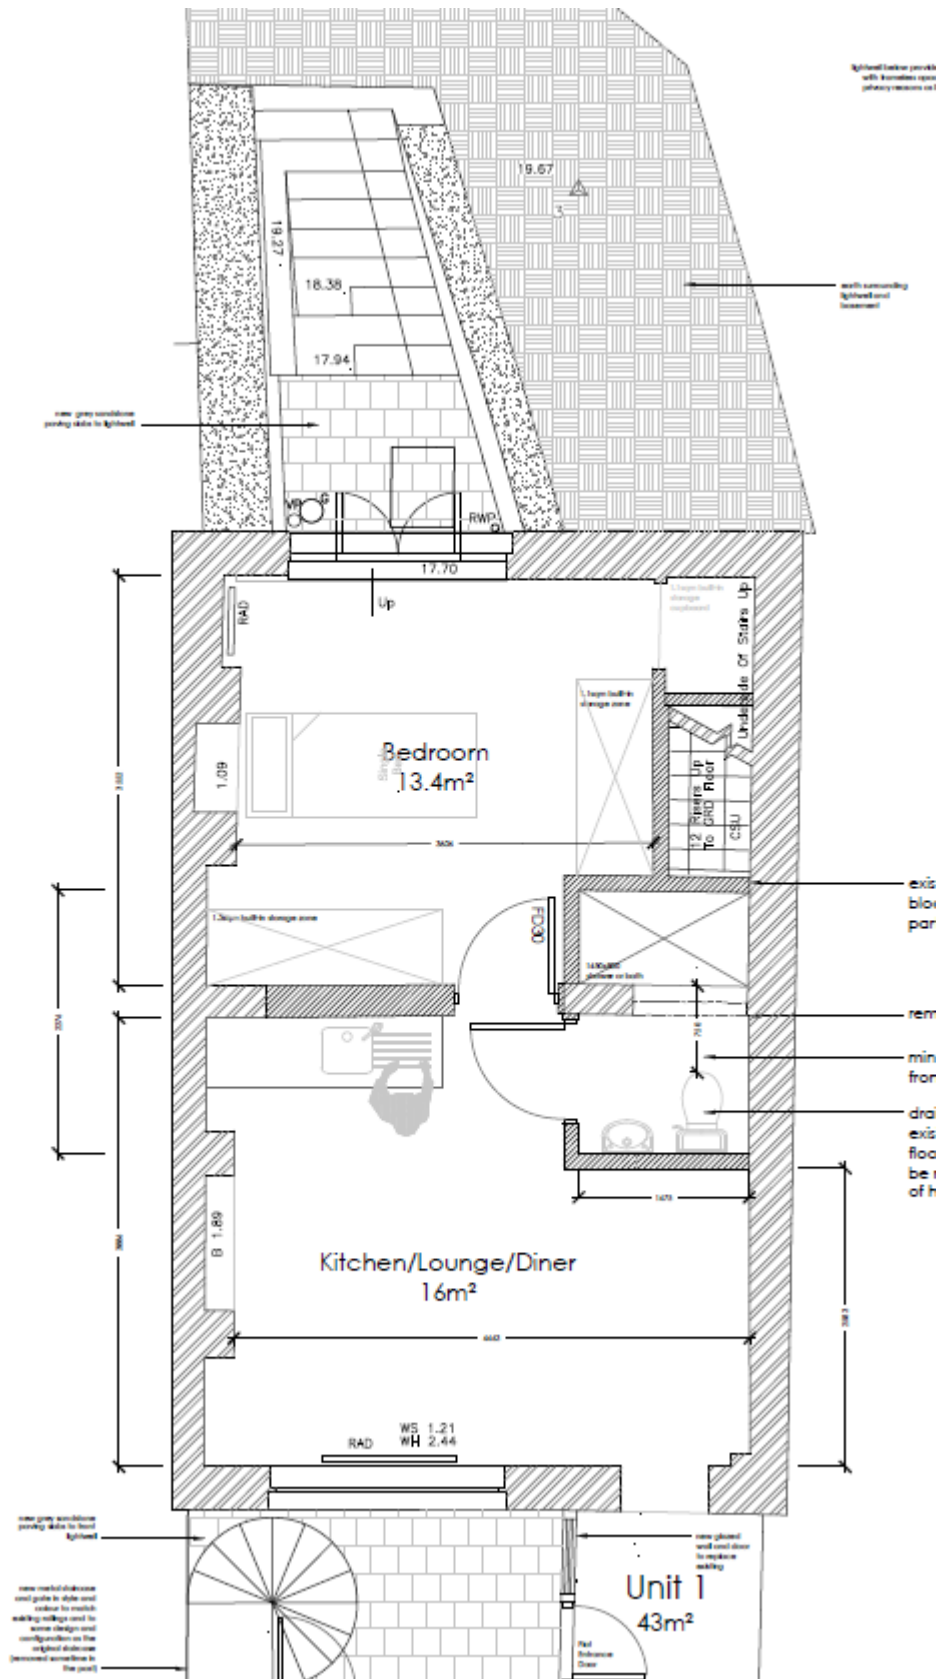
1 St Chad's Street Proposed Lower Ground Floor - Floor Plan
